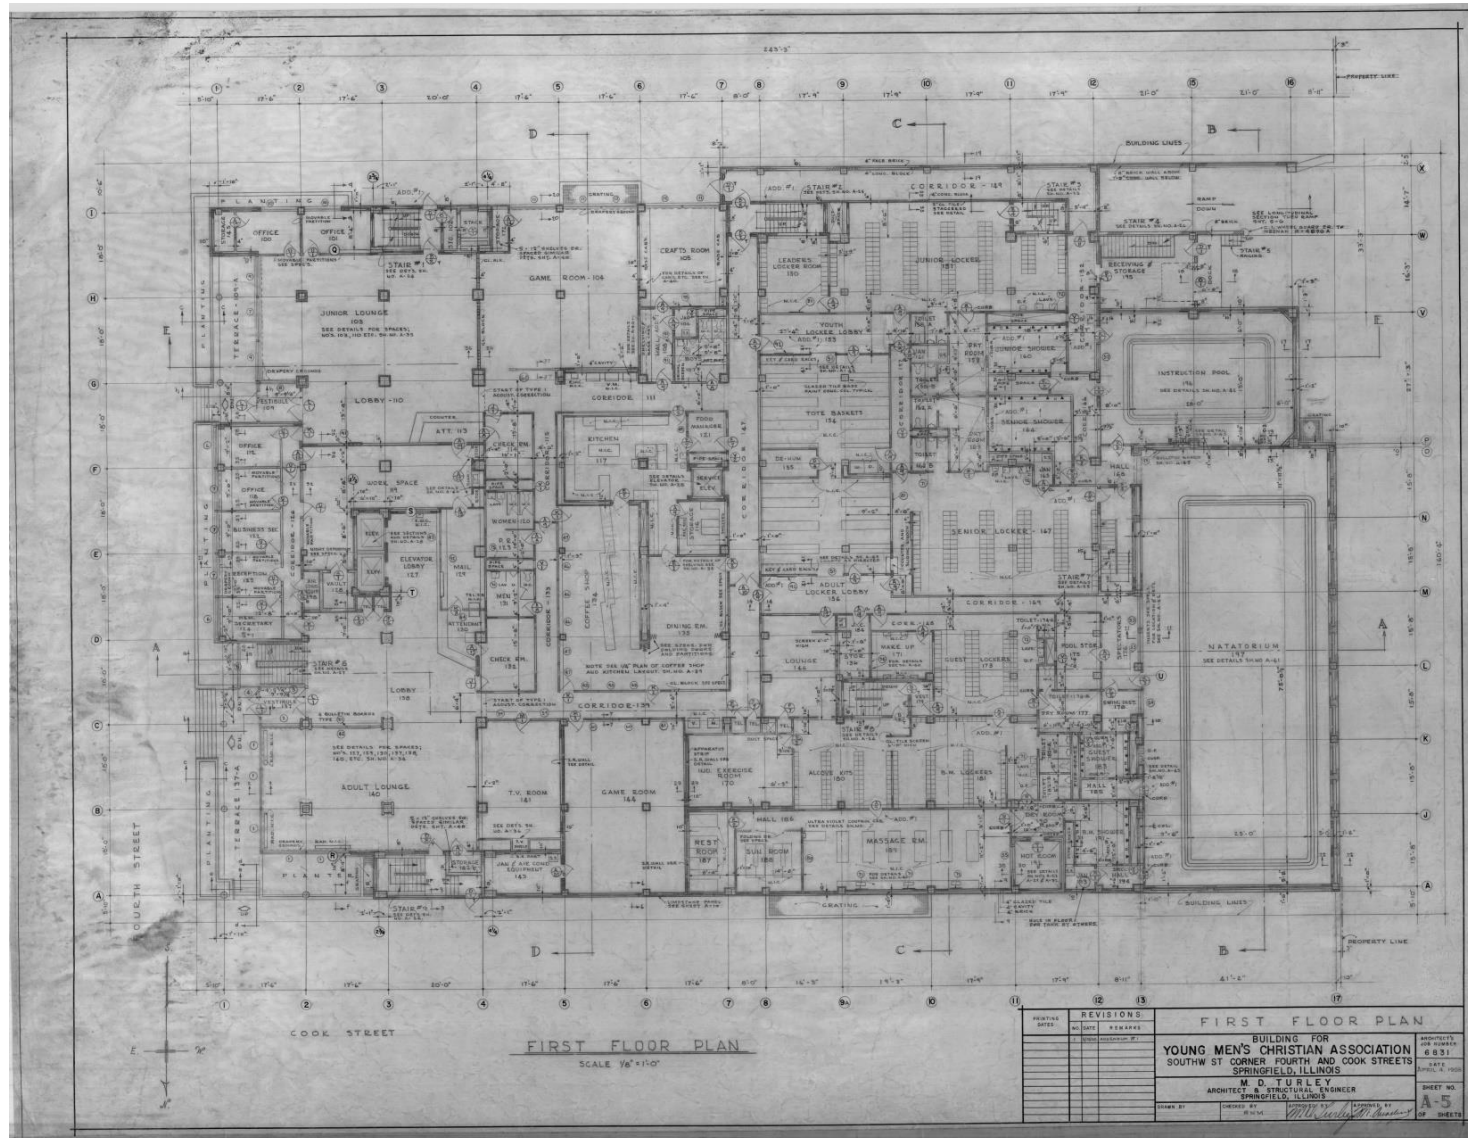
First Floor Plan, Building for Young Men's Christian Association (Turley 1958: Sheet No. A-5).
